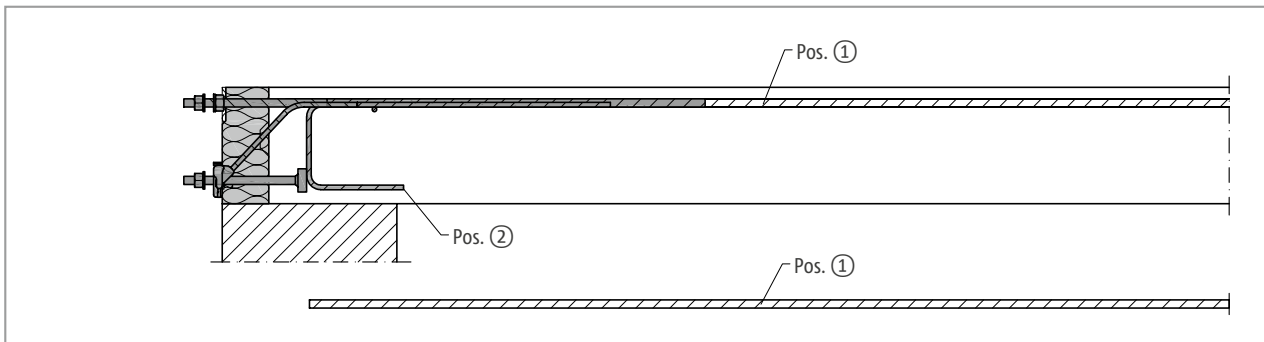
Schöck Isokorb® T type SK-M1: On-site reinforcement: Cross section
